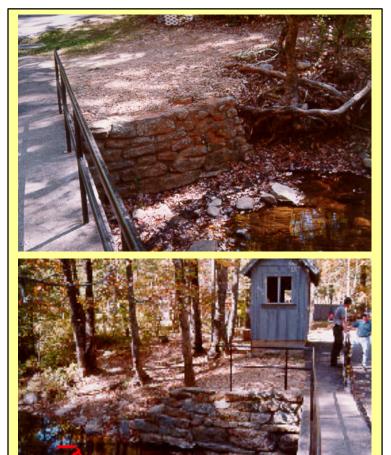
Damage to the Otter Bridge Abutments
